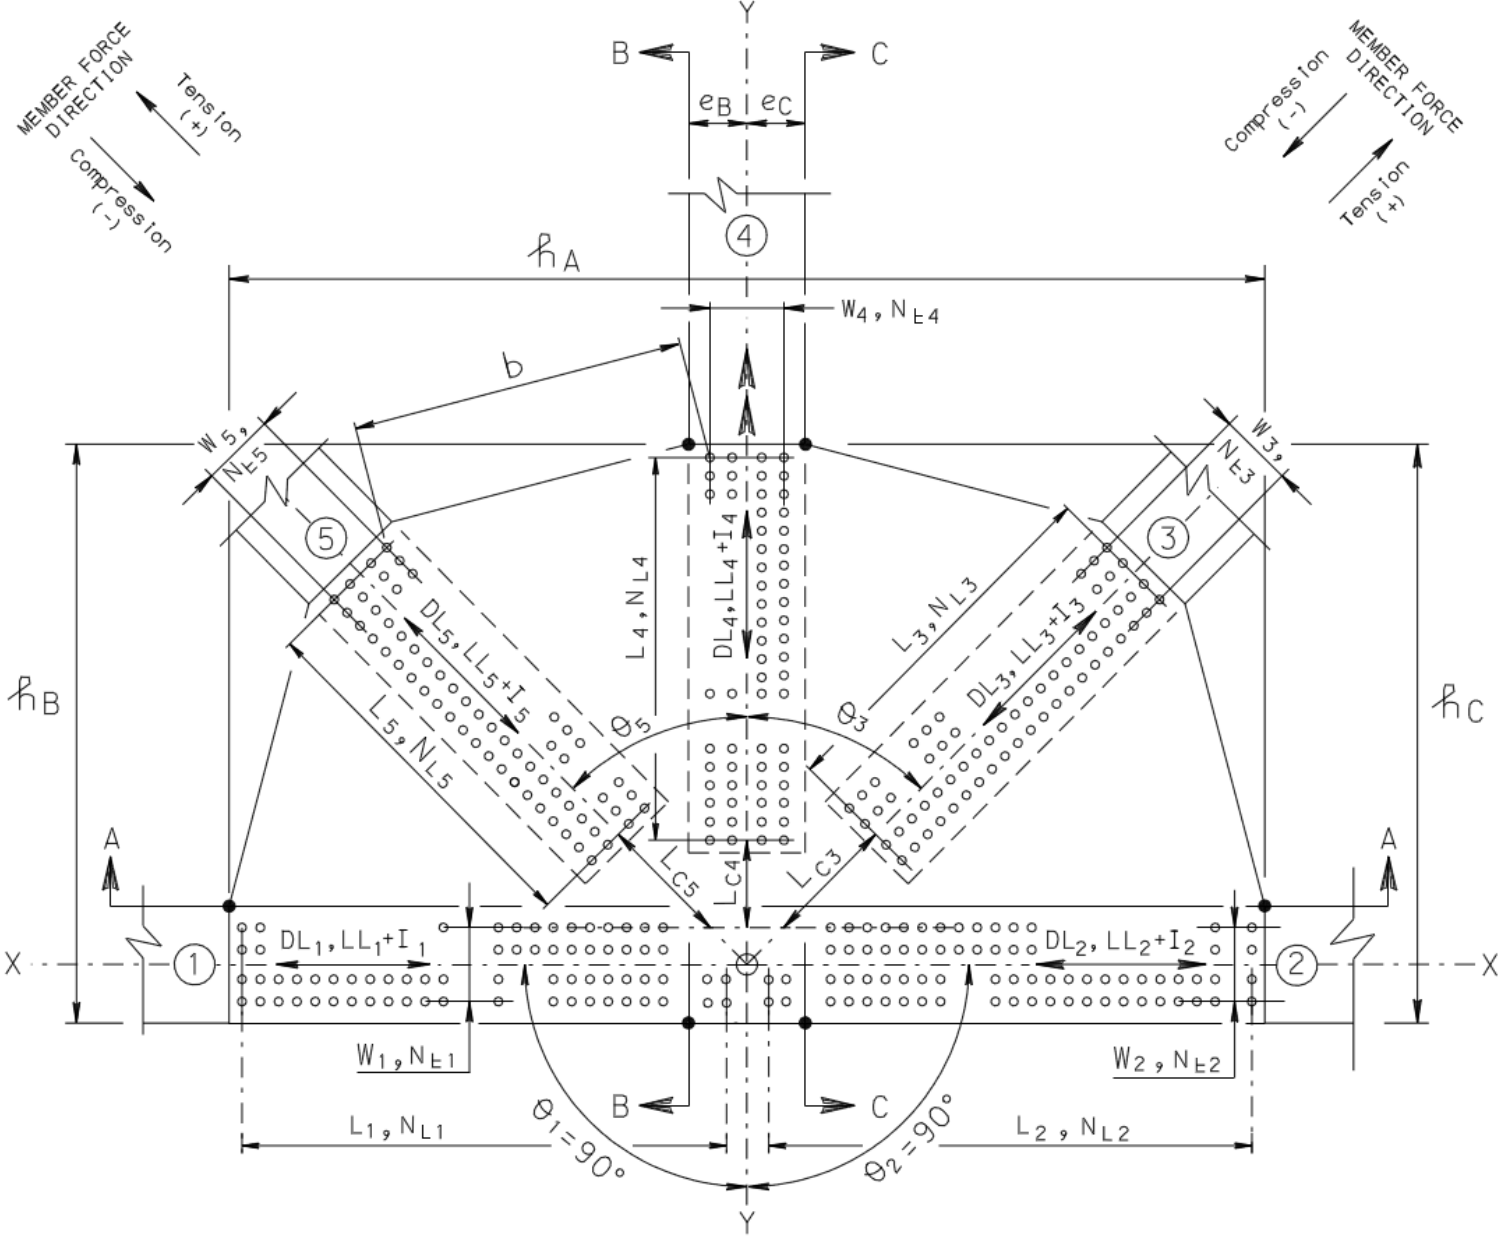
Gusset Plate Geometry: Horizontal Lower Chord
